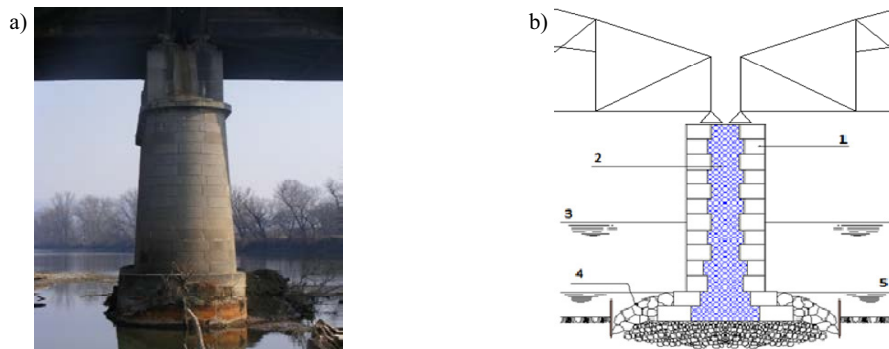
(a) piers of the bridge in Lipova; (b) the foundation of the bridge: 1 – natural stone, 2 – cyclopean.
